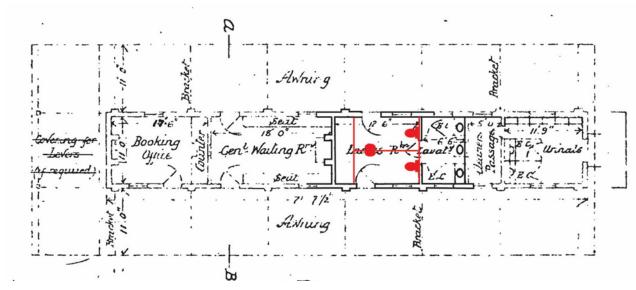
Plan of the original configuration of the Waitara Station building showing the modifications (in red) to the former Ladies Restroom to create the current male and female toilet configuration. (Plan Source: Sydney Trains Virtual Plan Room CV0241734) Note – outline of the Ladies Restroom added in black for clarity
